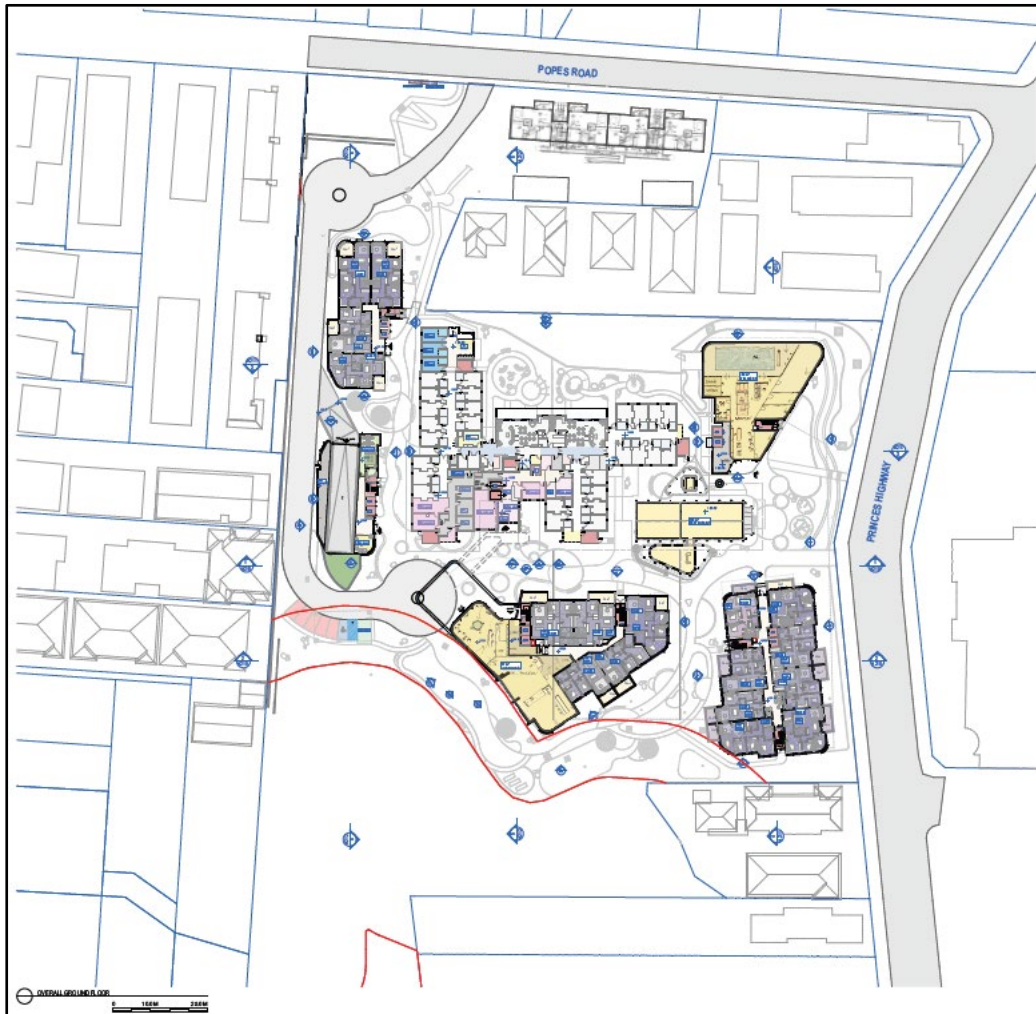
GROUND FLOOR PLAN (SOURCE: CALDERFLOWER)
